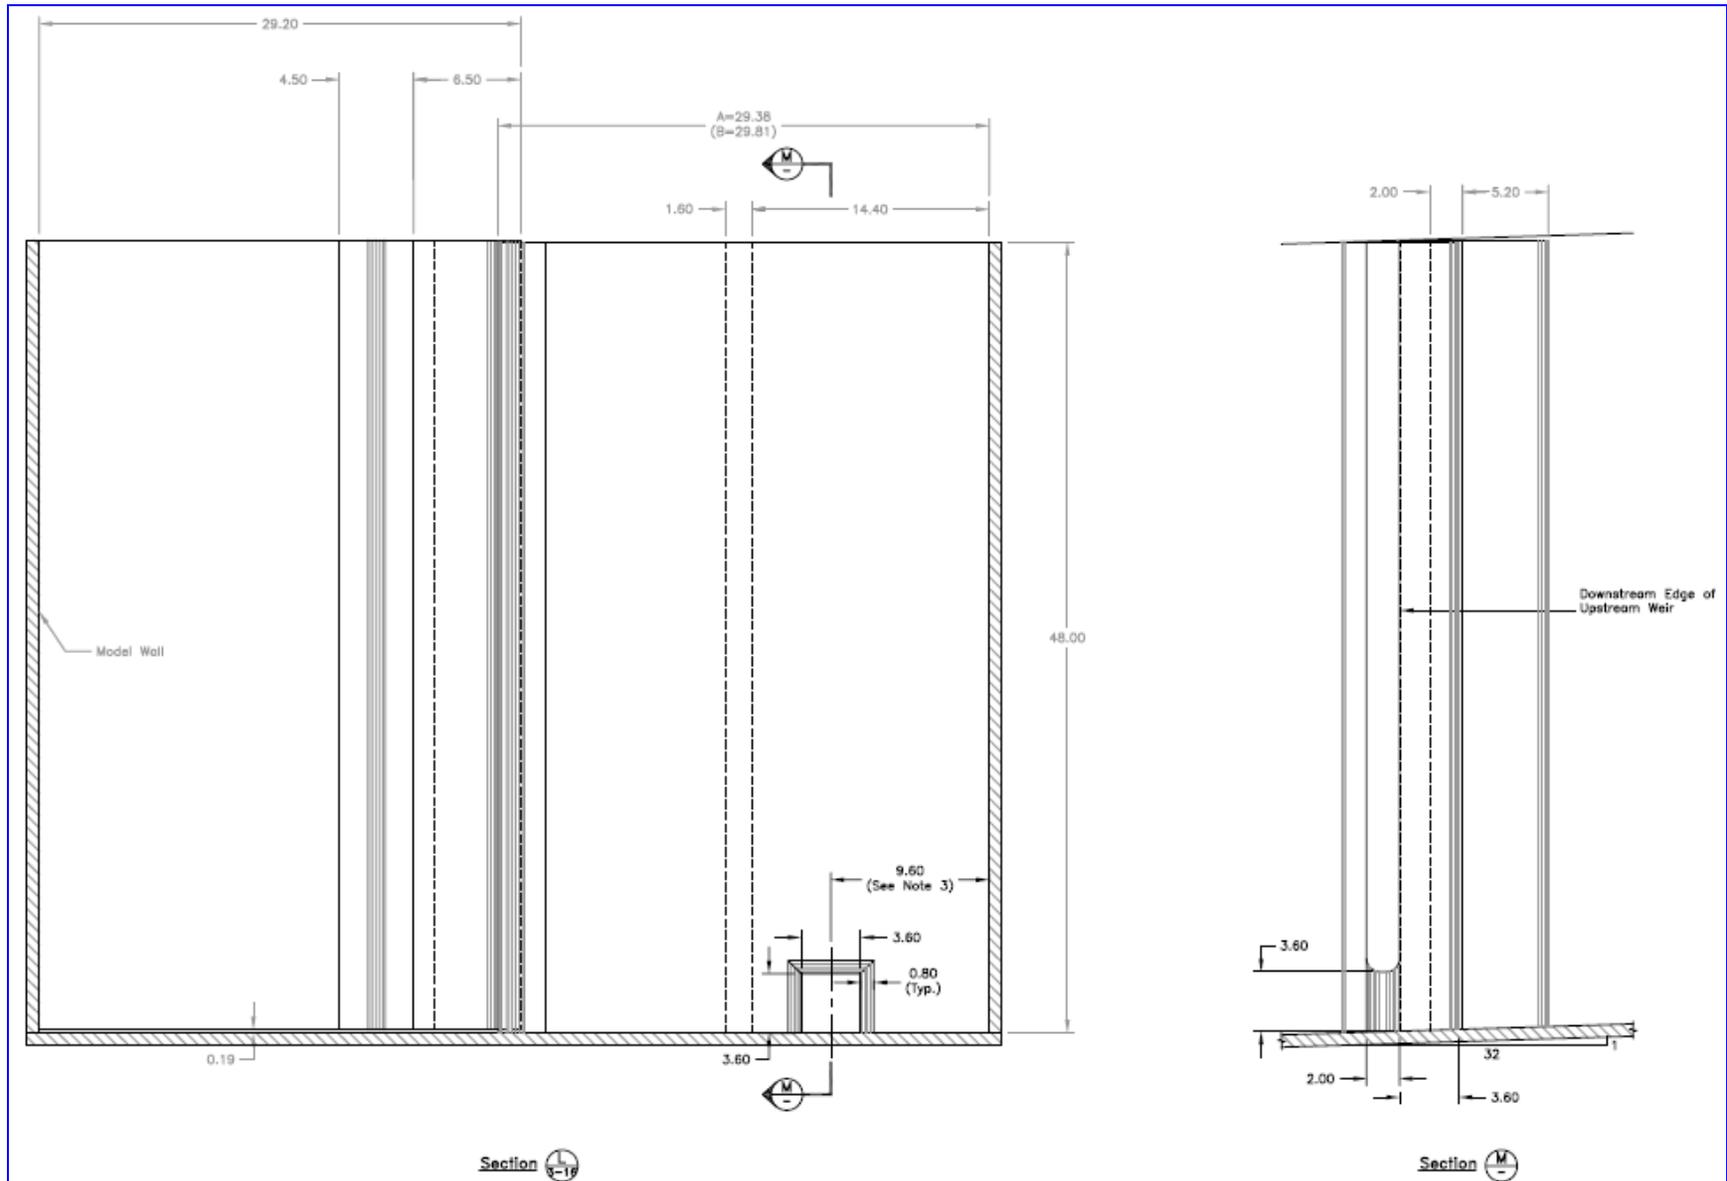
18-inch Weir Configuration, Elevation View (Weirs 2, 3, 18 -23)—Excerpt from Model Drawing 3-16 provided by ENSR (Inches Model Scale: 1:5)
